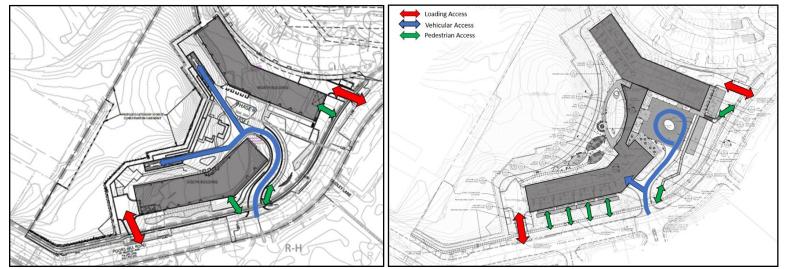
Approved Site Plan 81982098C Circulation (Left) vs. Proposed Site Plan Circulation (Right)
